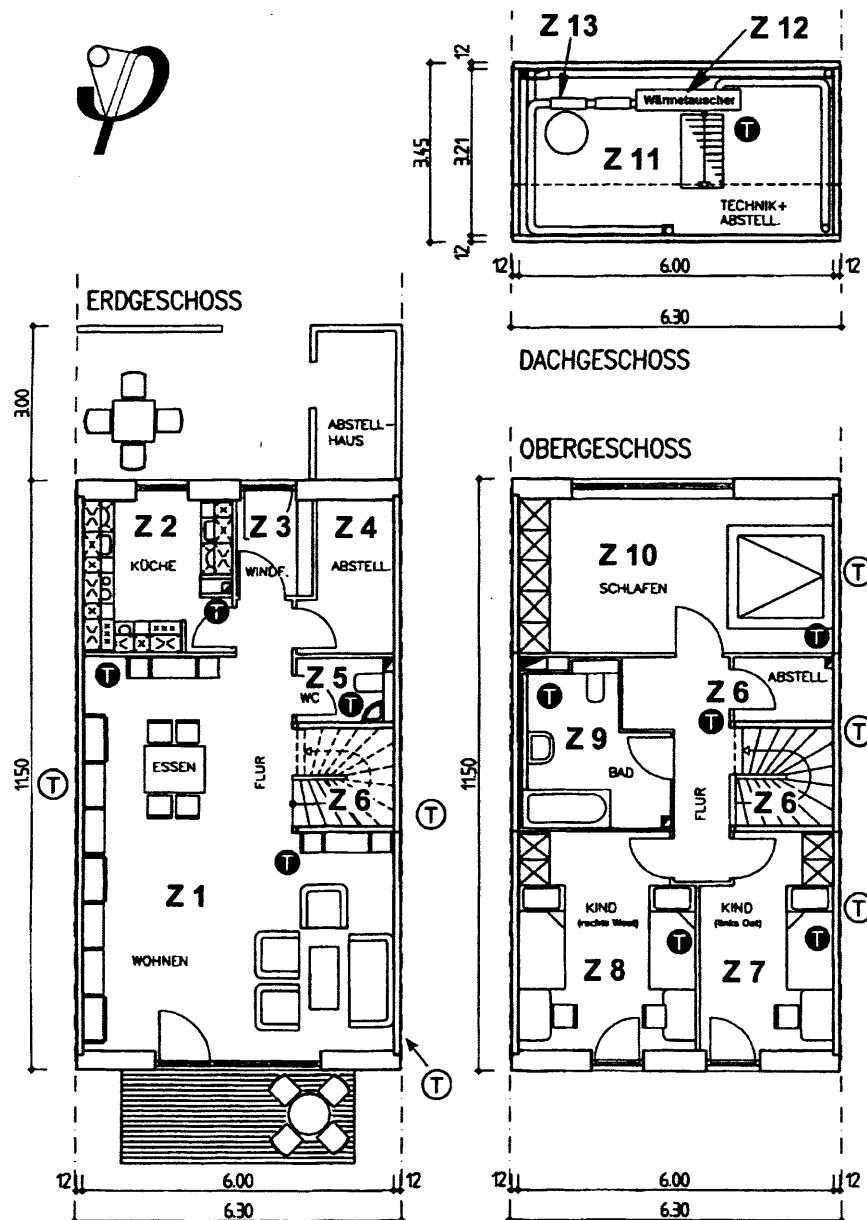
Building ground floor plan (left), upper floor plan (right) and service room in roof space (top right)
